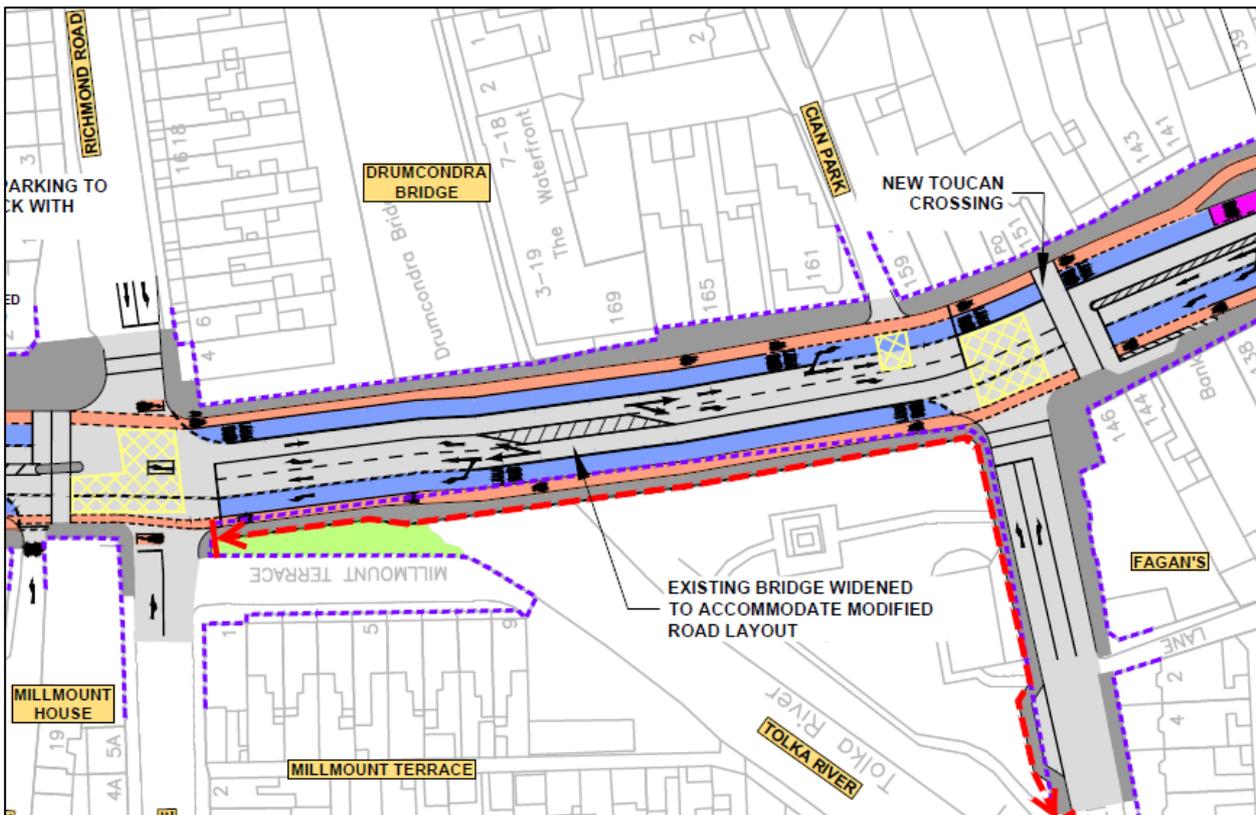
Emerging Preferred Route Layout – River Tolka Bridge
